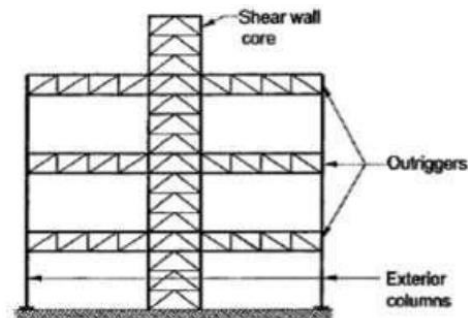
OUTRIGGER SYSTEM WITH A CENTRAL CORE
